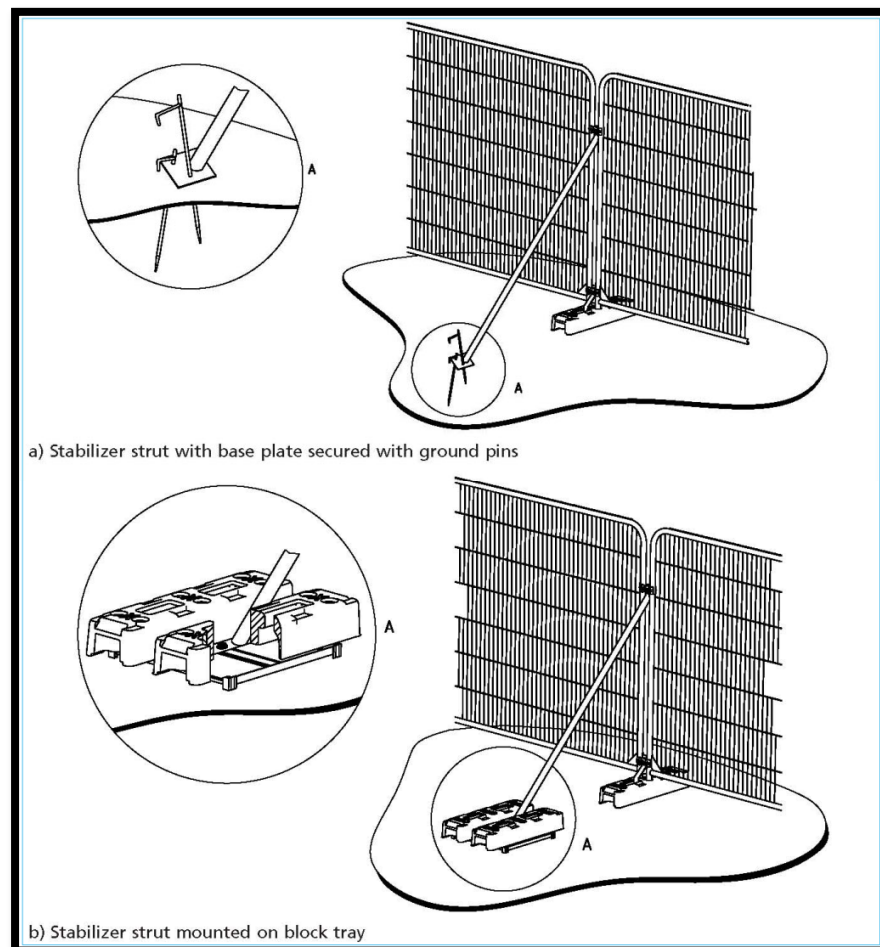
Examples of protective barrier fencing with above-ground stabilising systems (BS5837).
